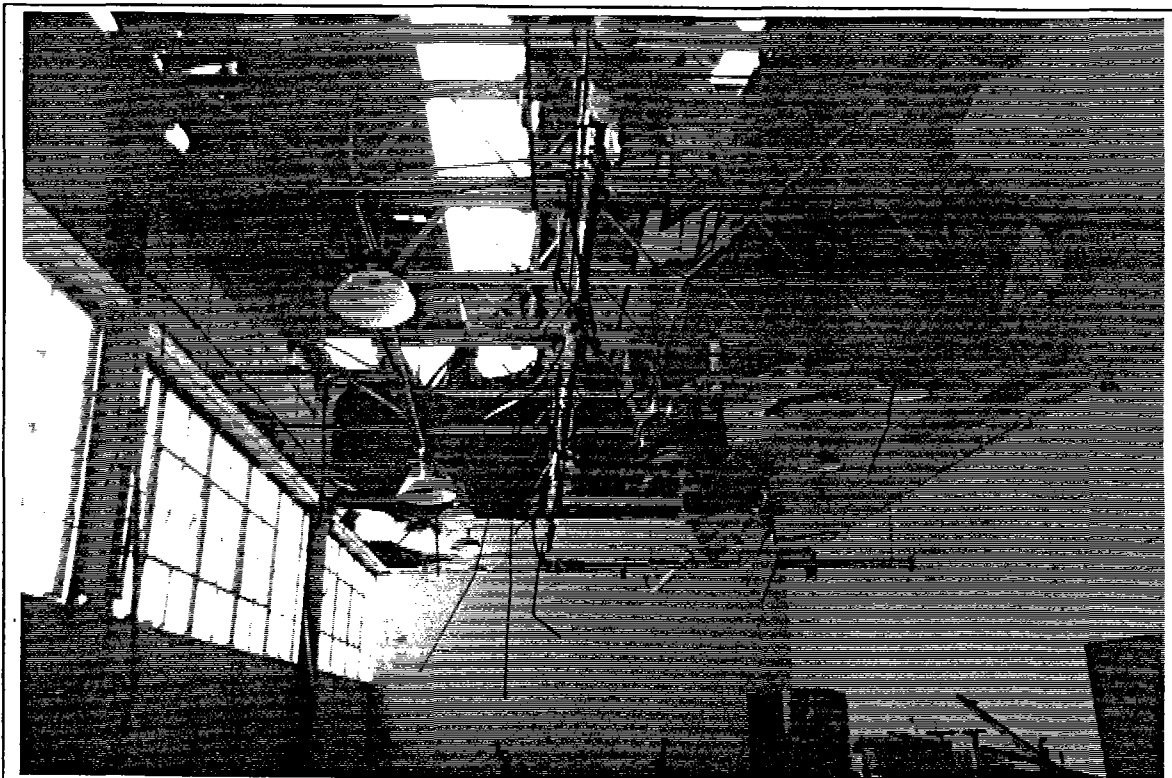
Building 41 - East side of building where water intrusion has caused collapse of non-asbestos plaster ceiling (Sample No. 1-029), non-asbestos concrete roof panels (Sample No. 1-030), and non-asbestos roof flashing material (Sample No. 1-031)
